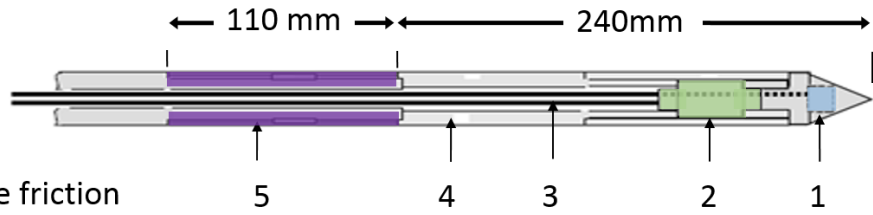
Simplified cross-section and view of the instrumented pile-probe
